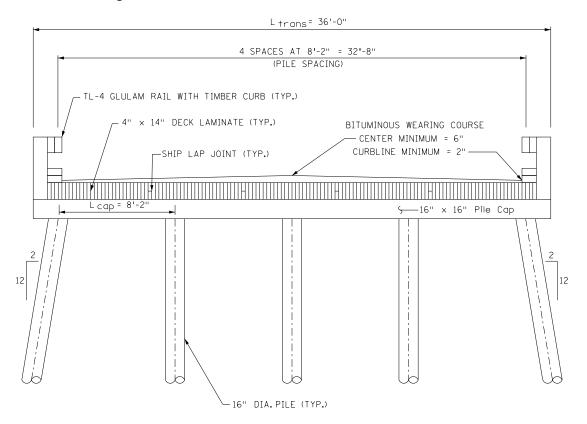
Longitudinal Timber Deck on Pier Timber Cap
